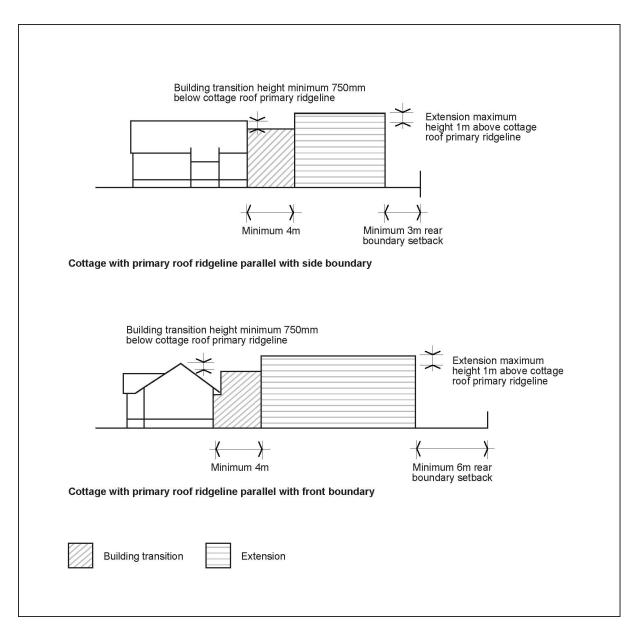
Figure A – Rear extension building envelope – building transition, extension bulk and scale.
